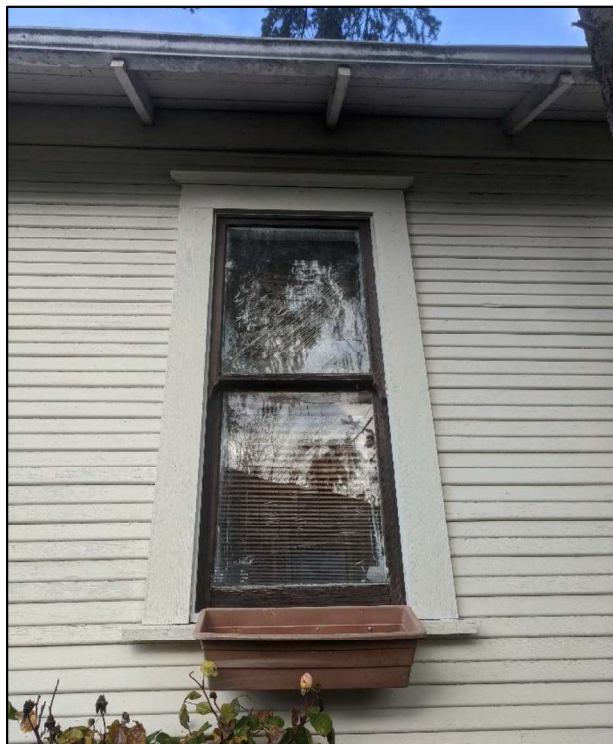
Southern side view of 3080 Washington Avenue, highlighting another good condition double-hung, horned wood window. (Source: Cummer, 2019)
